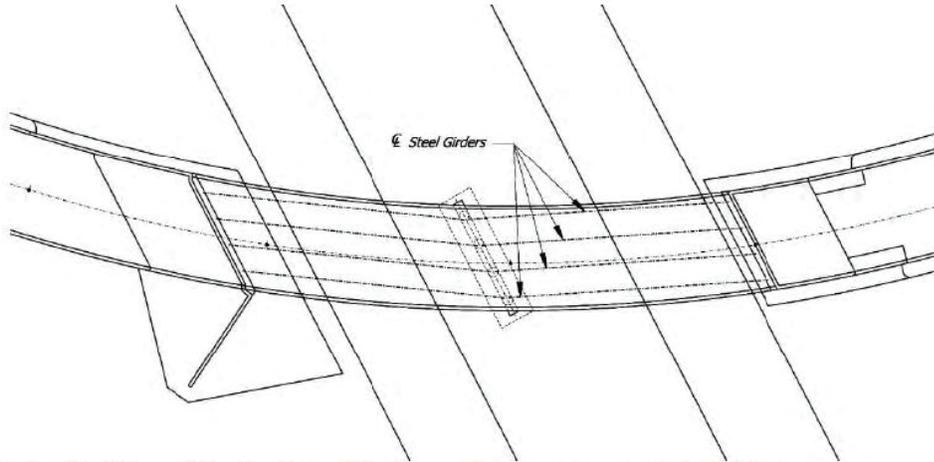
Plan view of a curved bridge with piecewise straight girders.
